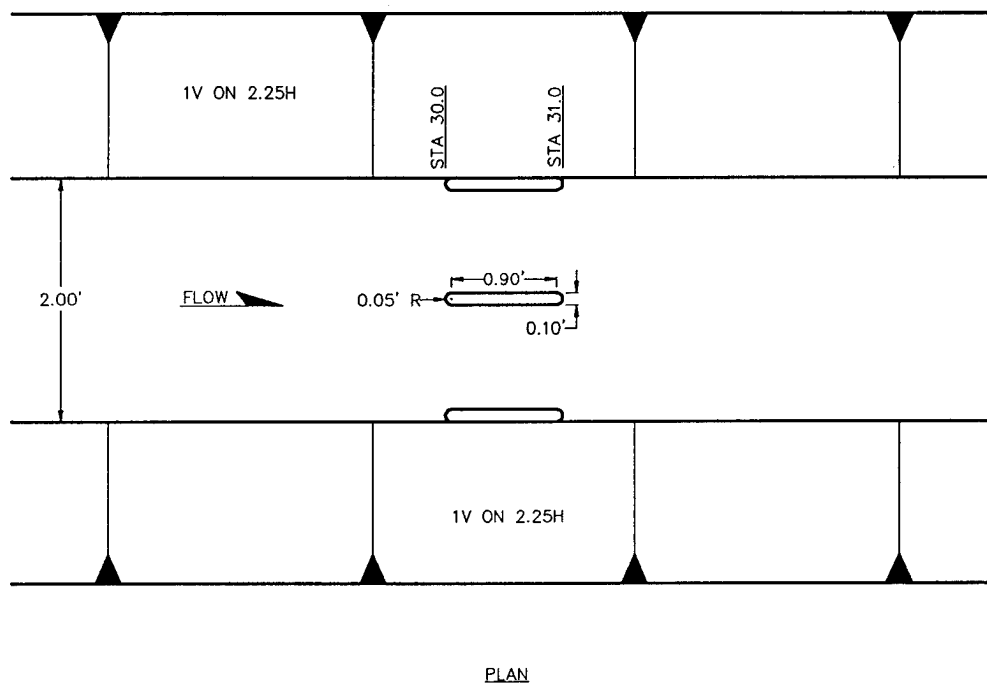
Plan view of multiple flow obstructions in the trapezoidal channel.
